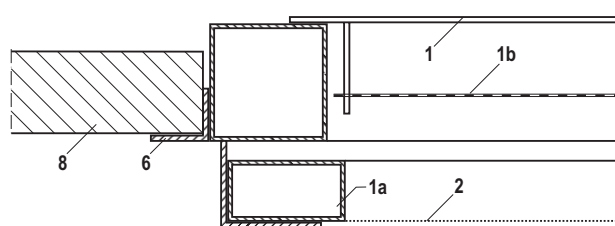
Air outlet housing 1 installed flush with ceiling, false ceiling 8 placed on ceiling connection profile 6, standard design
